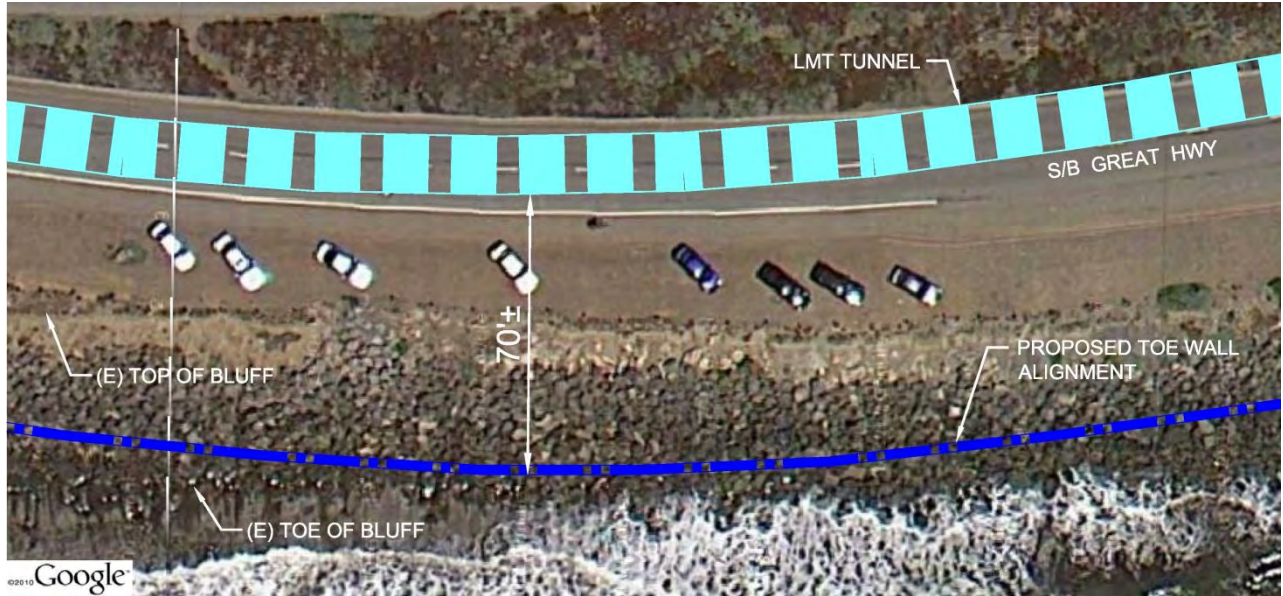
Typical Toe Wall Alignment (shown at EQR)
